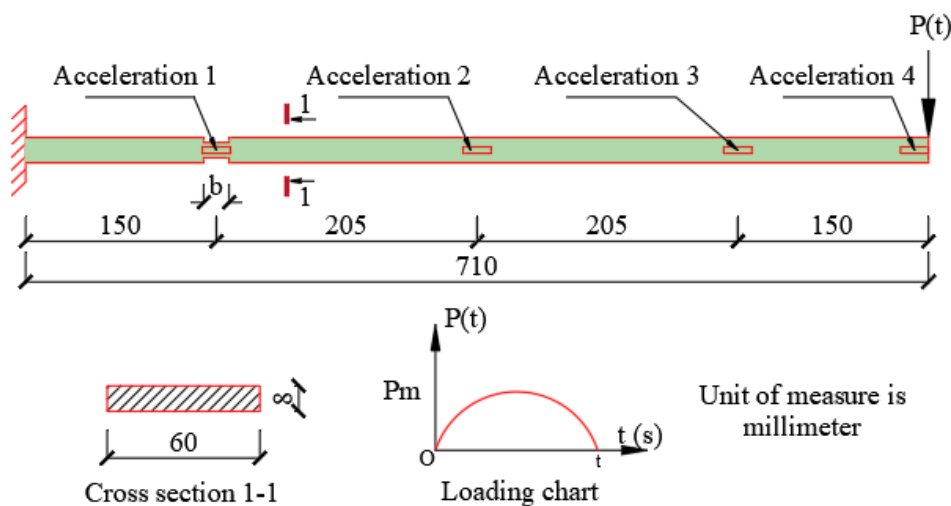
Structural diagram of beam with reduced cross-section at quarter-span.
